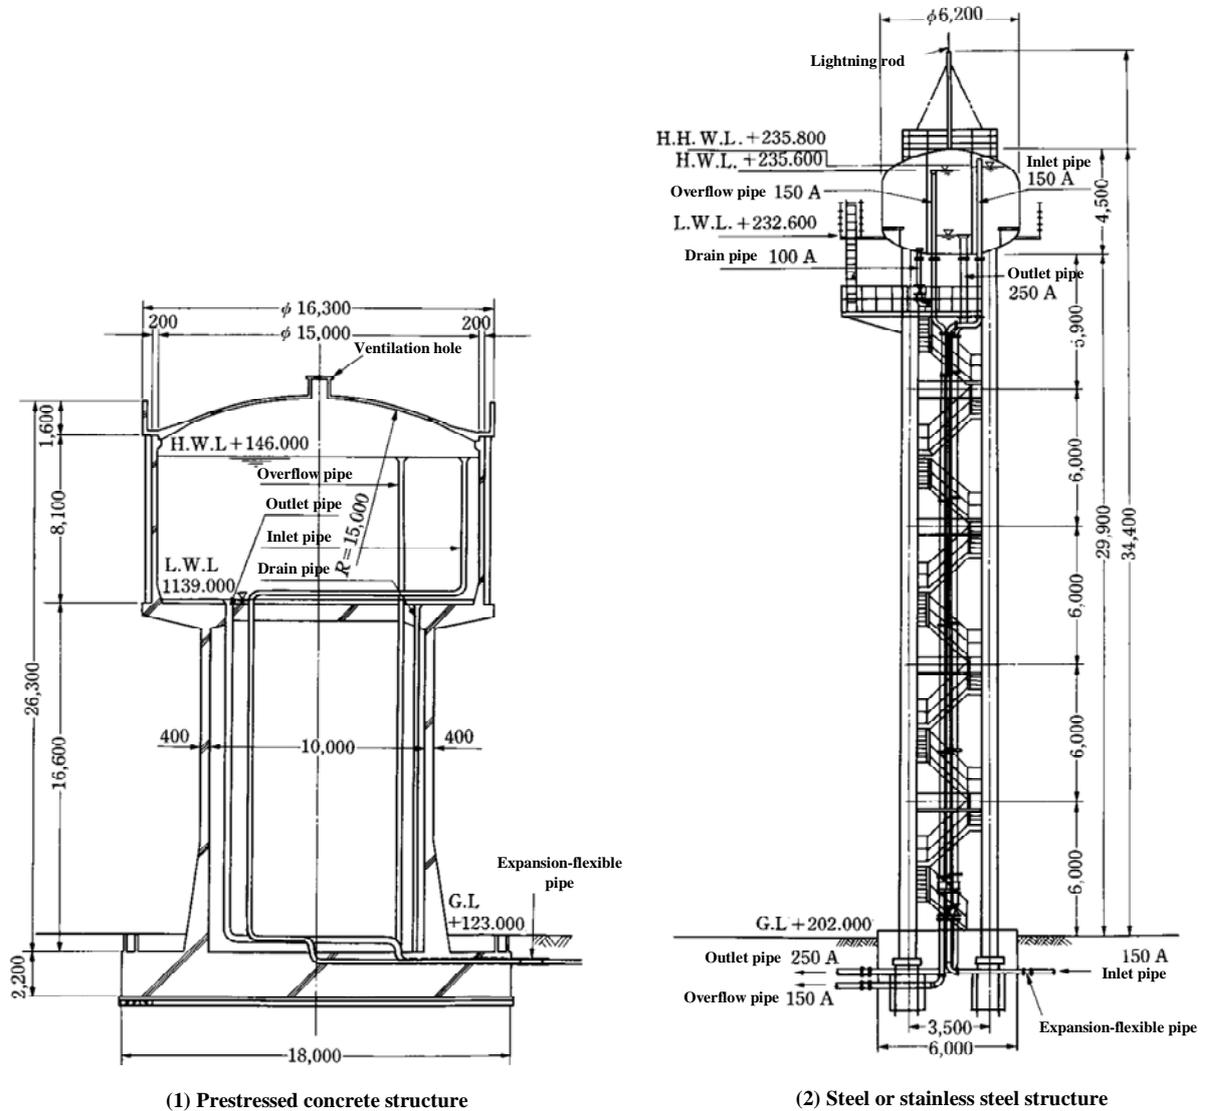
Examples of the structure of elevated reservoirs (Unit: mm)
